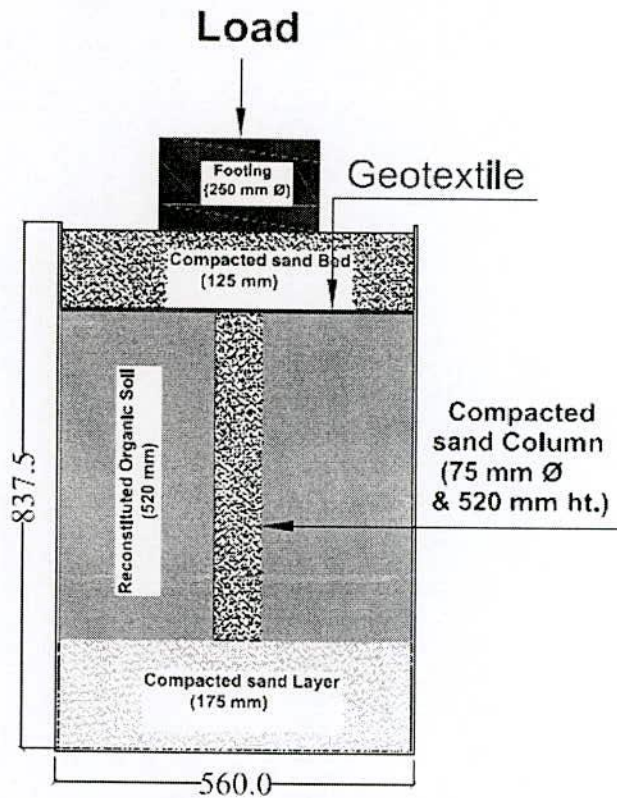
Ground treated with compacted sand bed- geotextile and sand column (G-5.1)
